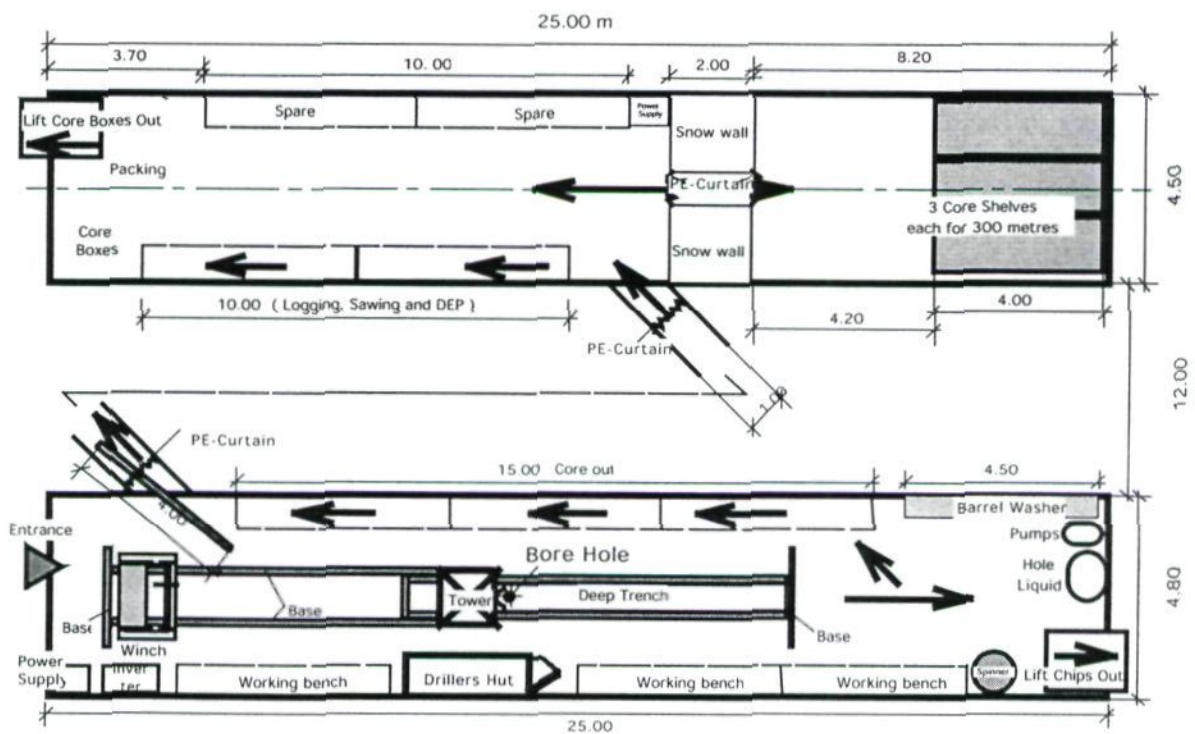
Ground plan of drill and science trench (measures in m). the arrows mark the way of ice core processing
